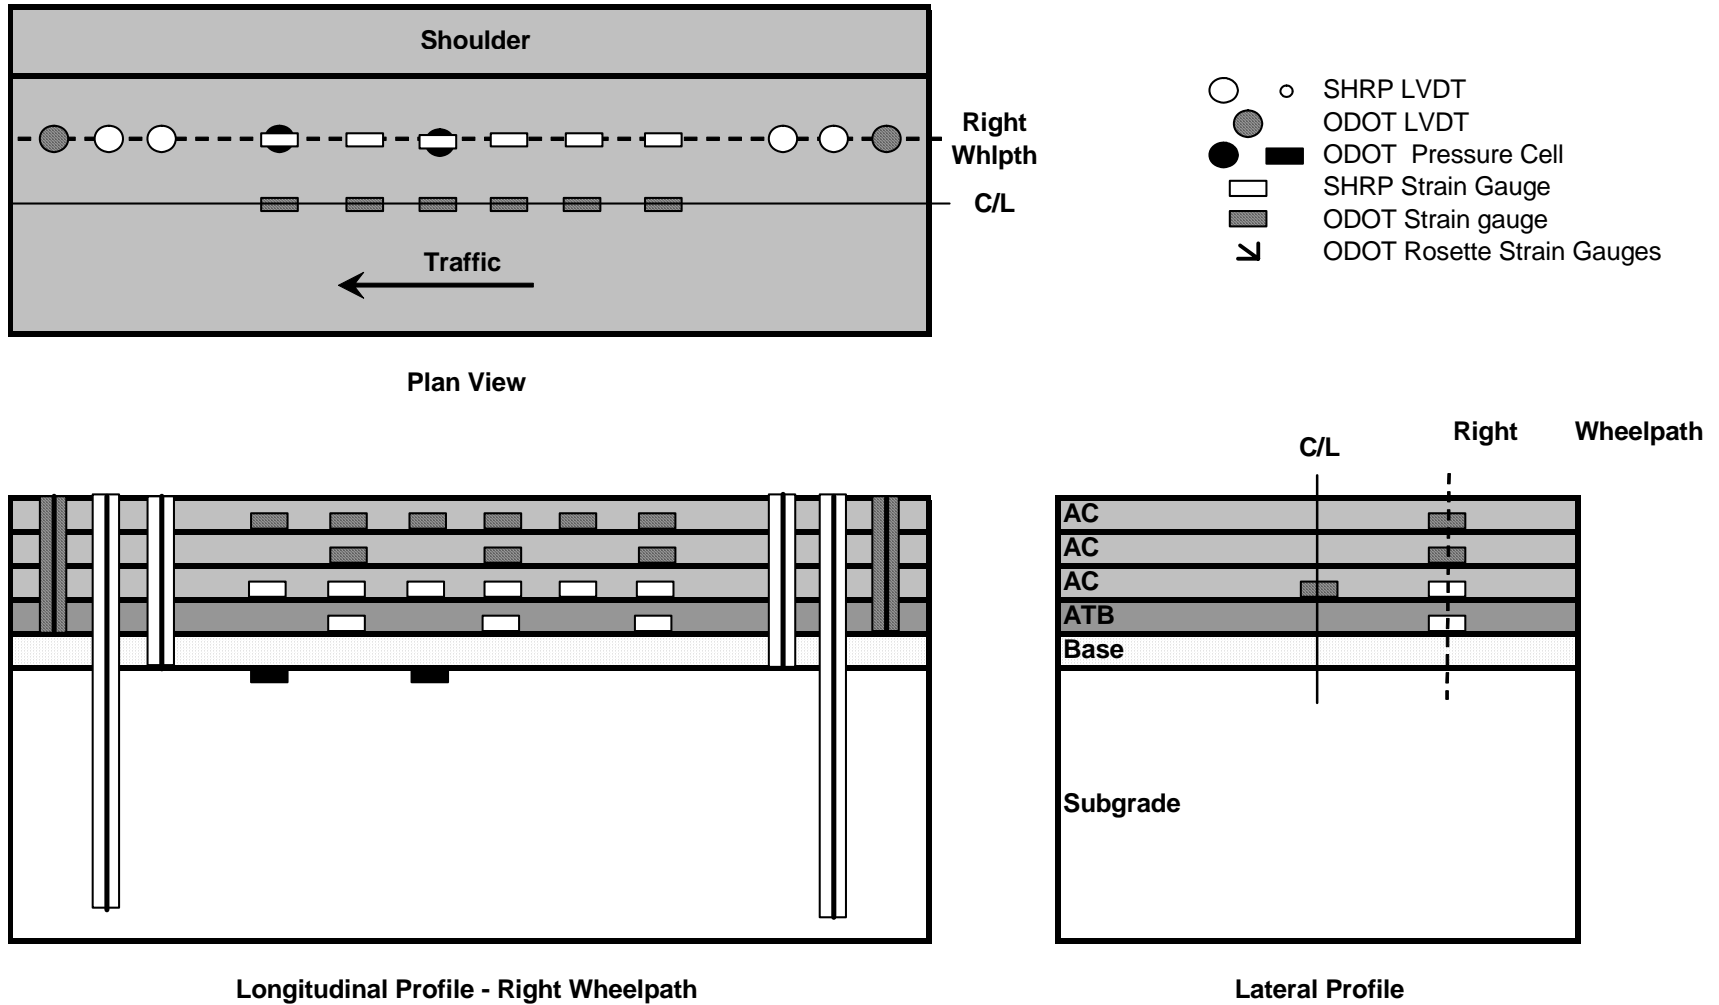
Typical Instrumentation Placed in AC Pavement Sections
